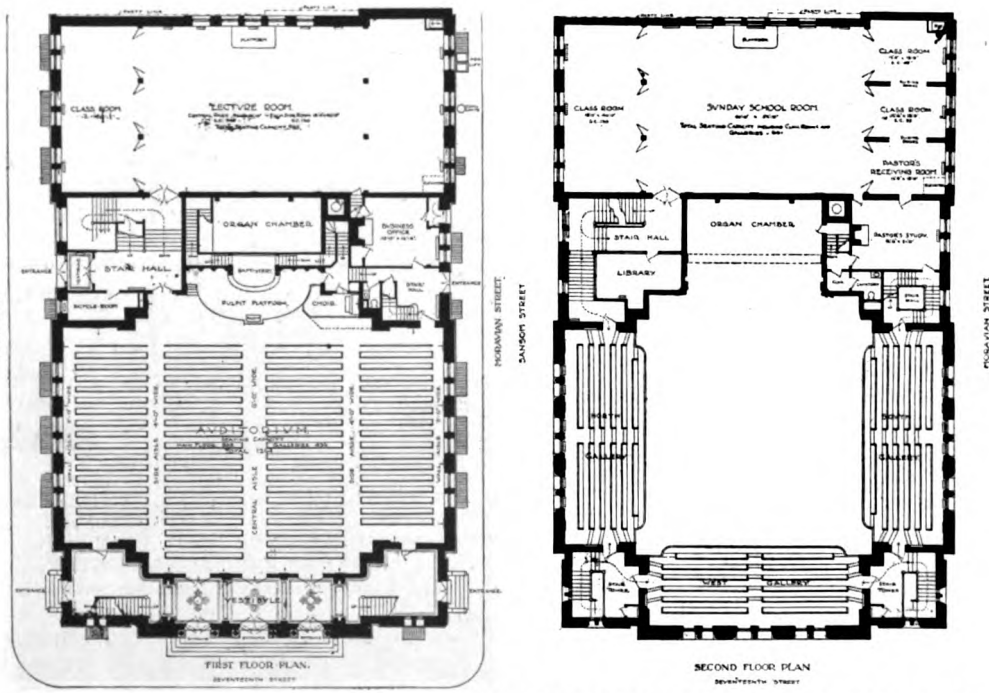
FIRST BAPTIST CHURCH, PHILADELPHIA, PA. GREEK CROSS AUDIENCE HALL PLAN.
